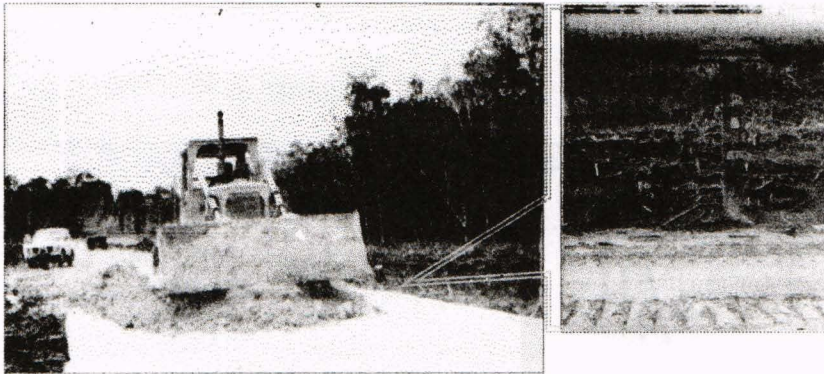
Road Soil Fill Settlement on Shallow Peat Soil
